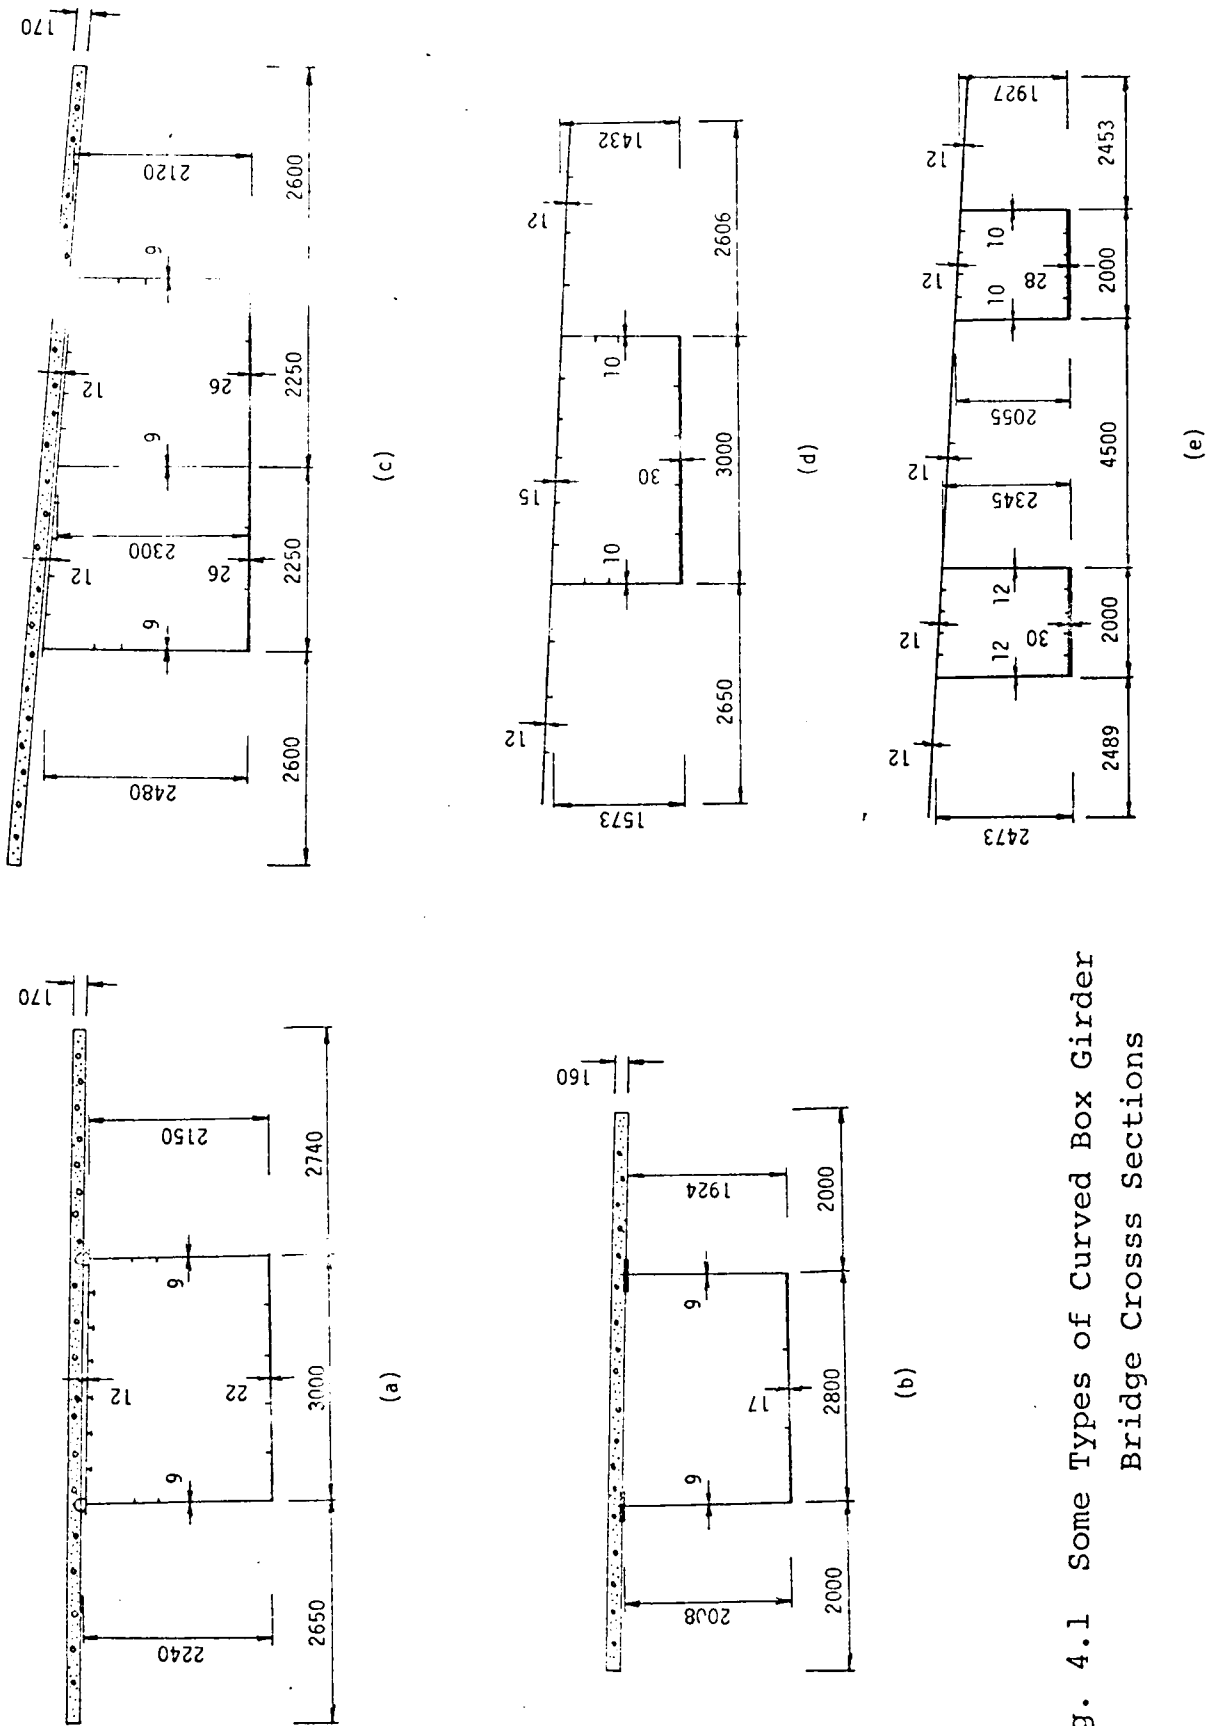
Some Types of Curved Box Girder Bridge Cross Sections
